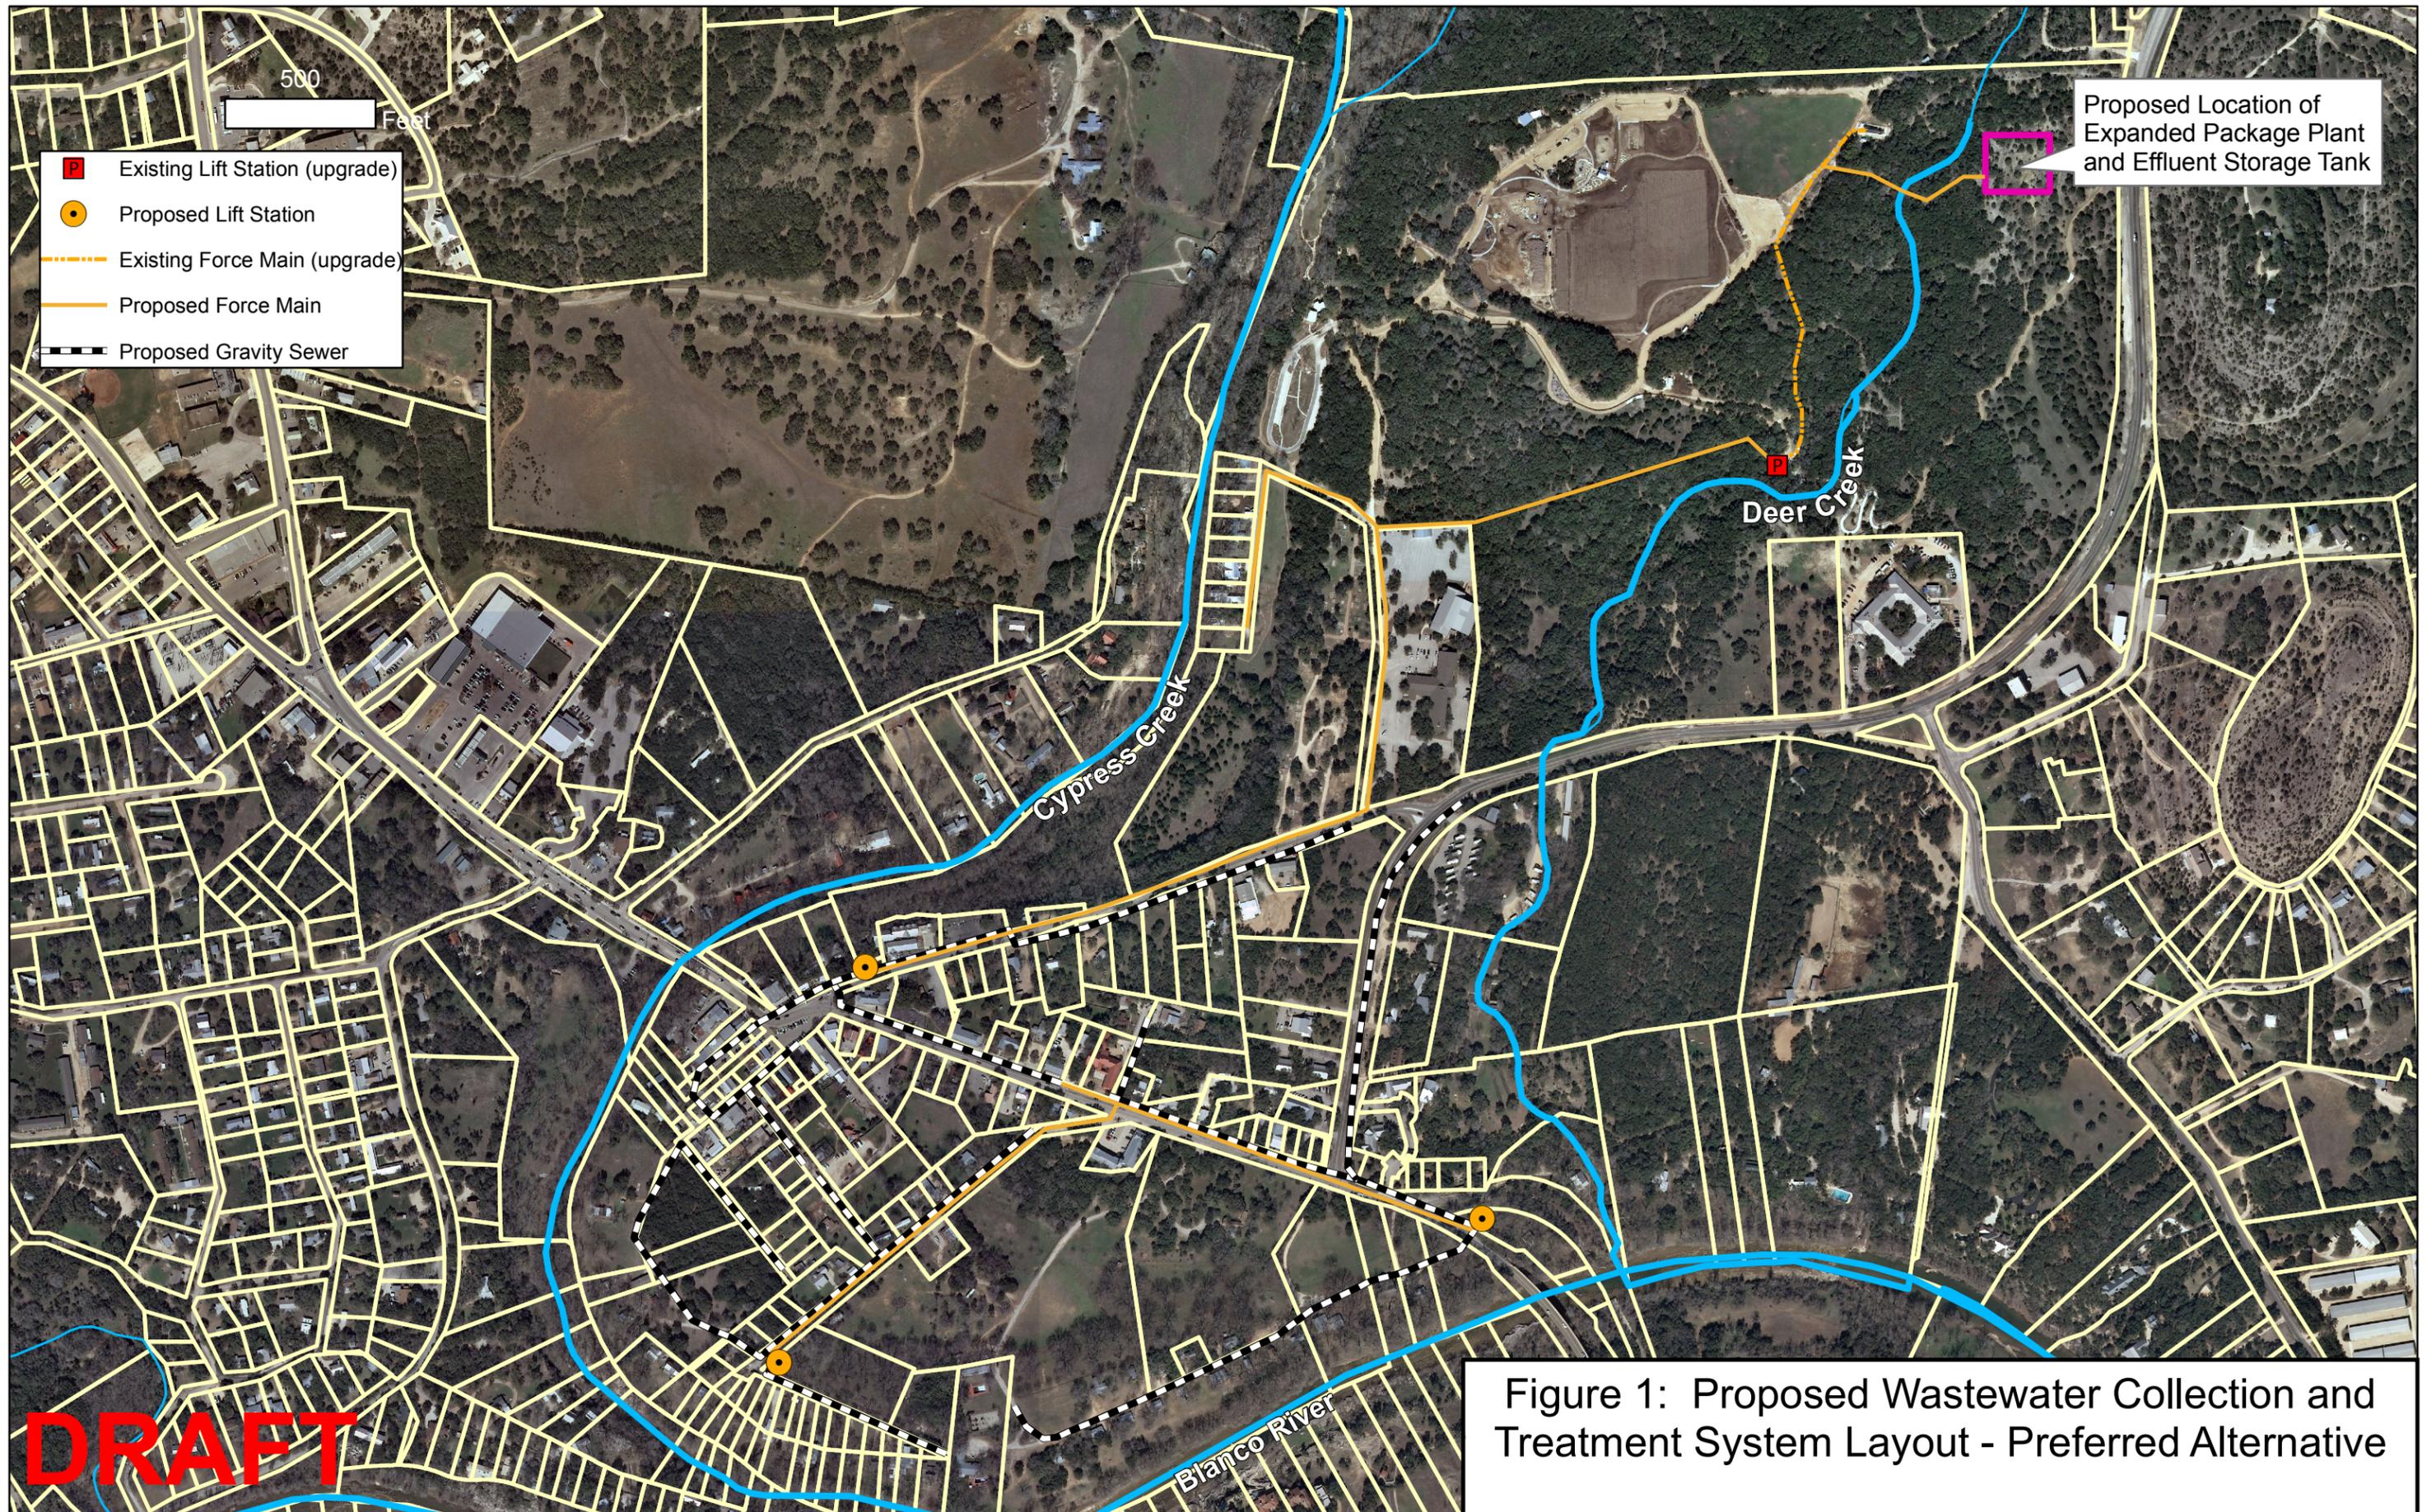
Proposed Wastewater Collection and Treatment System Layout - Preferred Alternative
